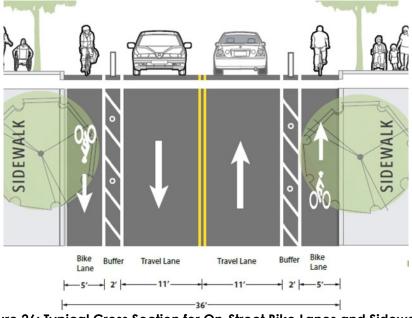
Typical Cross Section for On-Street Bike Lanes and Sidewalks
